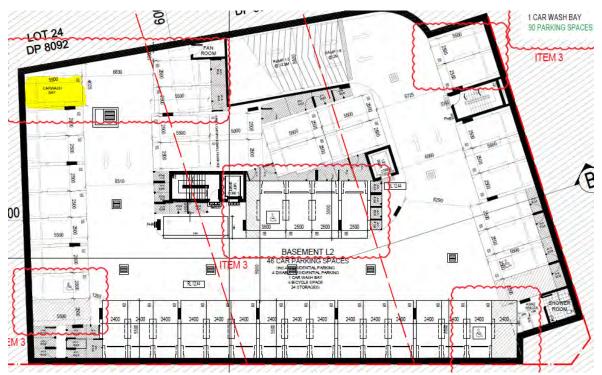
Extract of Basement Level 2 plan depicting amended car wash bay location in yellow highlight
